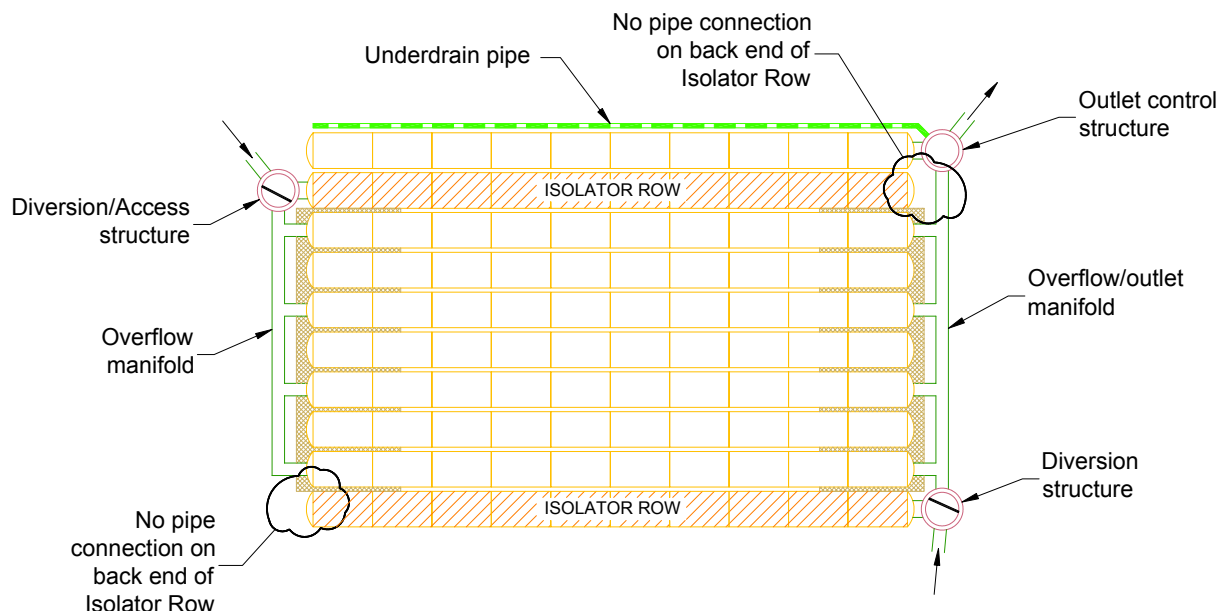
Typical StormTech Chamber Layout with Isolator Row
